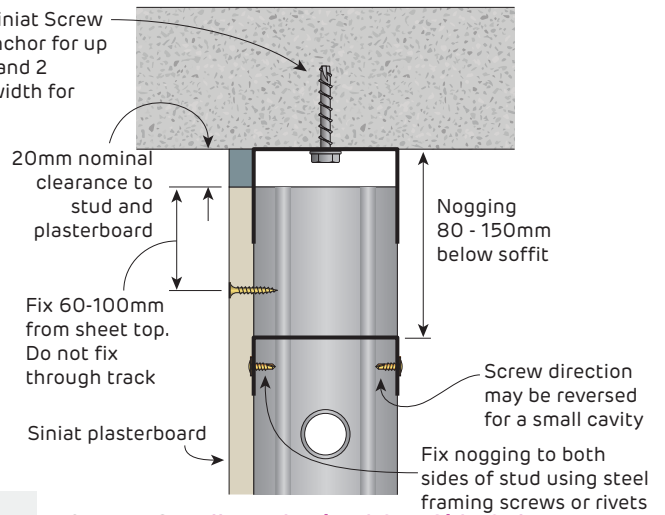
Wall Head - Lined One Side Only Deflection Head Track Section
